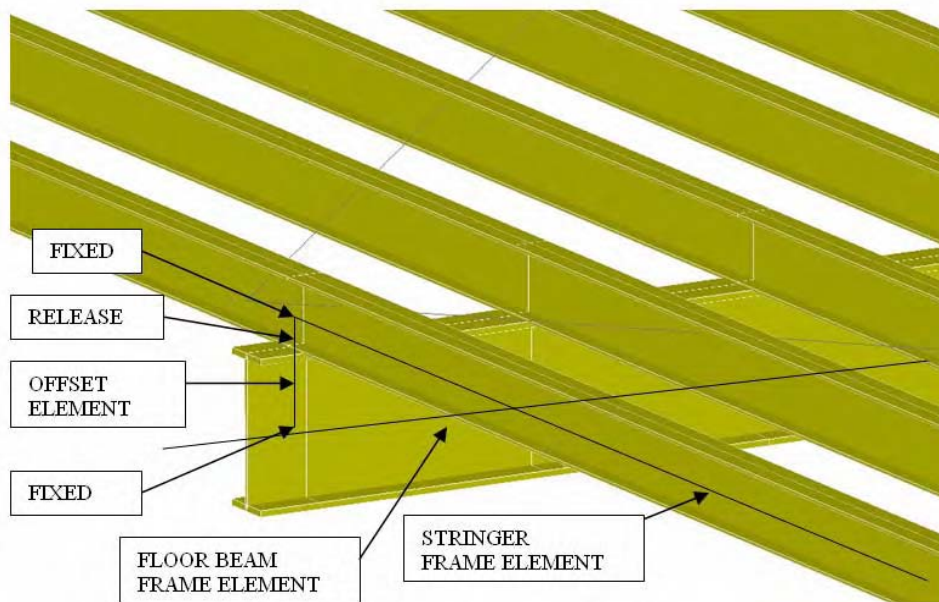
Rifle Bridge: Rendering of stringers on a steel floor beam. The rendering was produced by RAM Advanse 3D. The dummy offset elements used to connect the floor beam and stringer have a rotational release at the beam-to-stringer interface.
